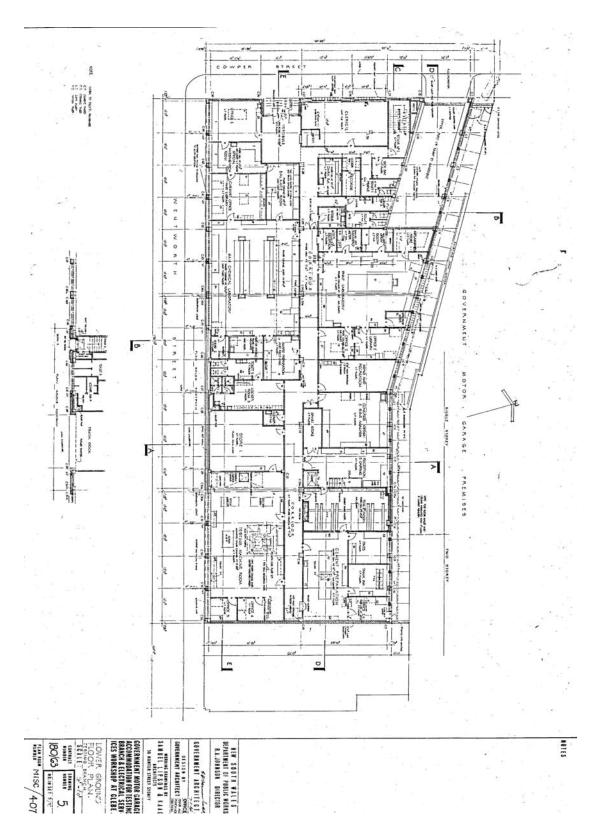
Ground floor plan of the Testing and Inspection Branch building of the Public Works Department
